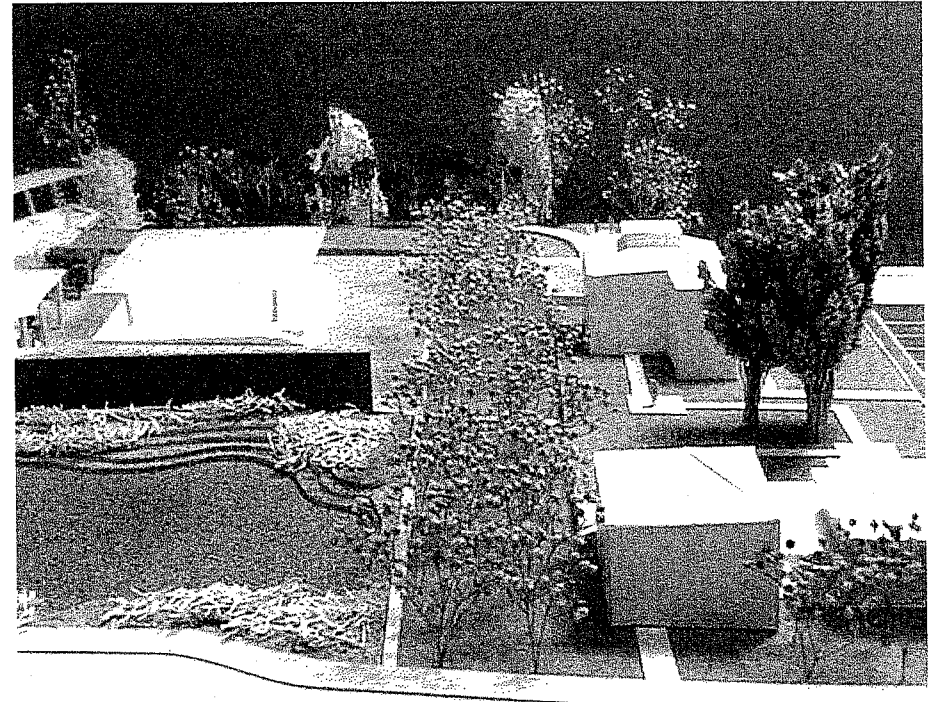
Overview of Park from Coolidge Avenue, Site Model
